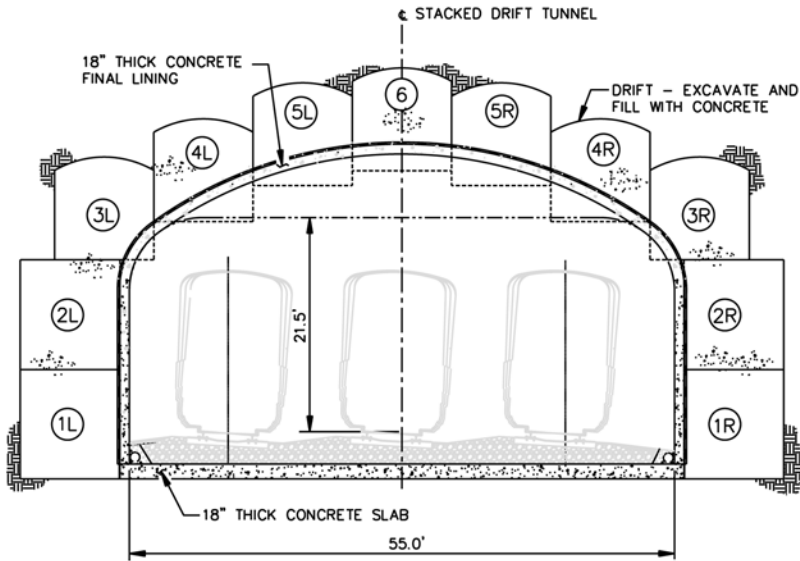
Typical tunnel section for stacked drift tunnel alternative
